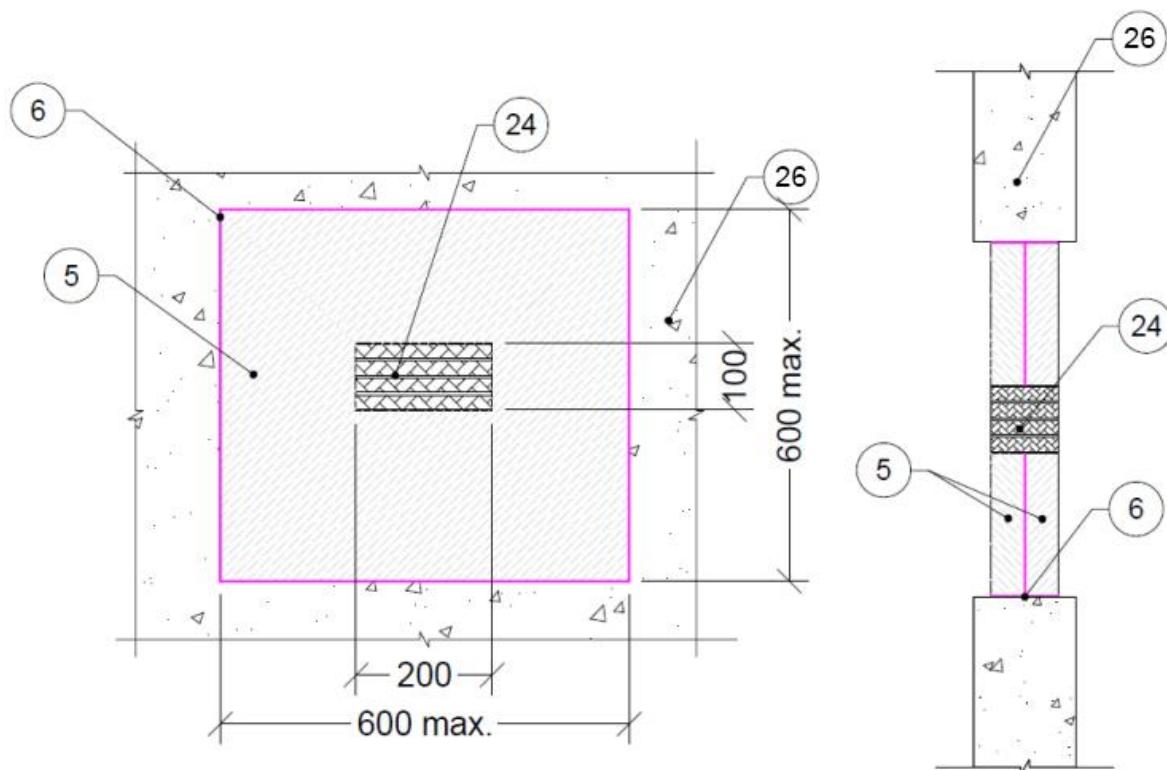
Section View of Optic Fibre Cables in TBA Firefly™ Intubatt in Vertical Substrates
